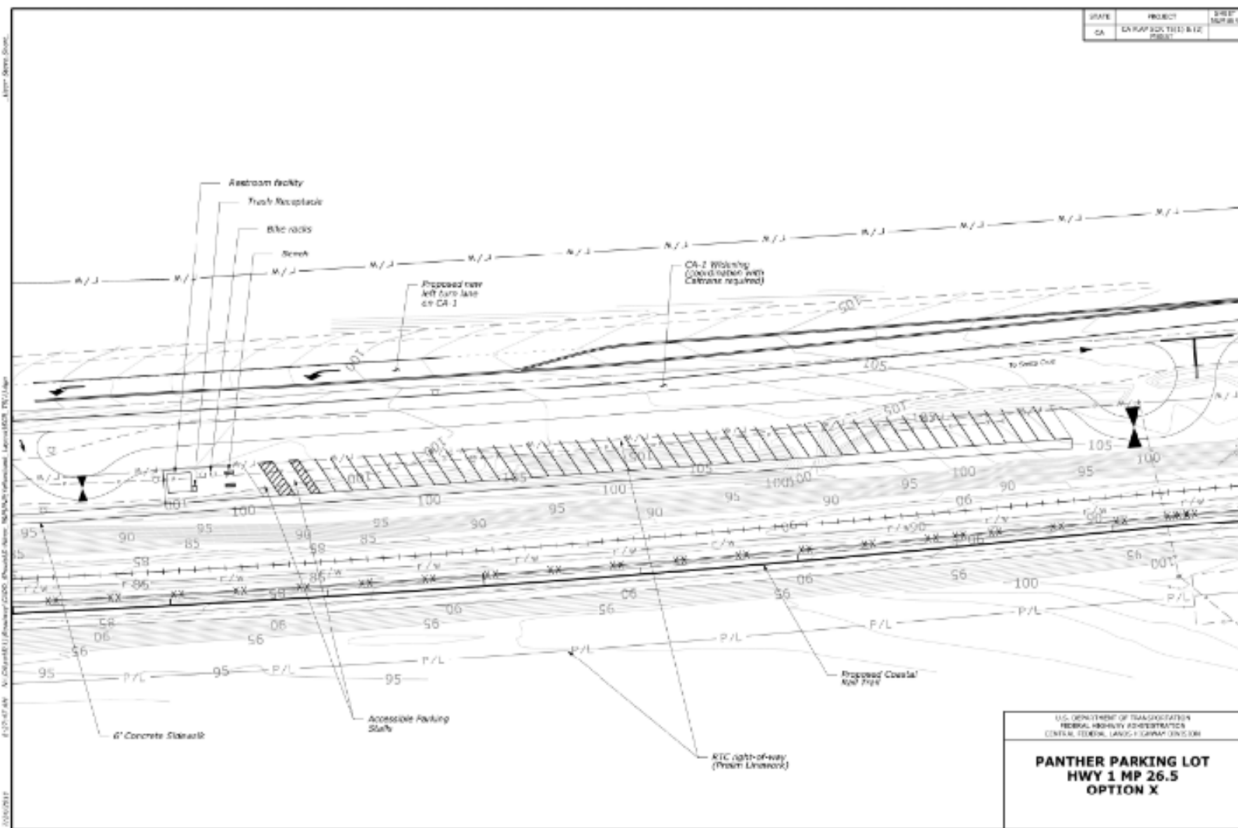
Panther/Yellowbeach Beach Parking Area Reconfiguration Plan
